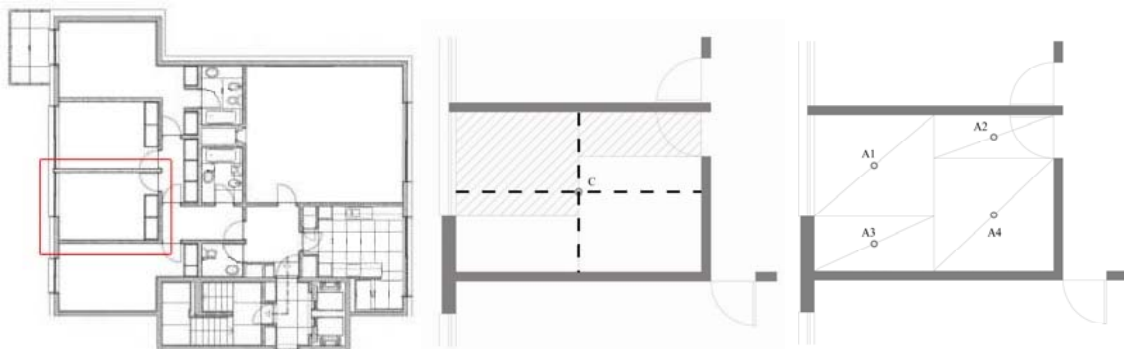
Boa Vista House, architect: Alvaro Siza, Porto, Portugal. Subdivision of a sleeping room in enclosed spaces and placement of the geometrical centre point *A* of each enclosed space considering the projection of the openings (door and window) on the vertical axial line *y
